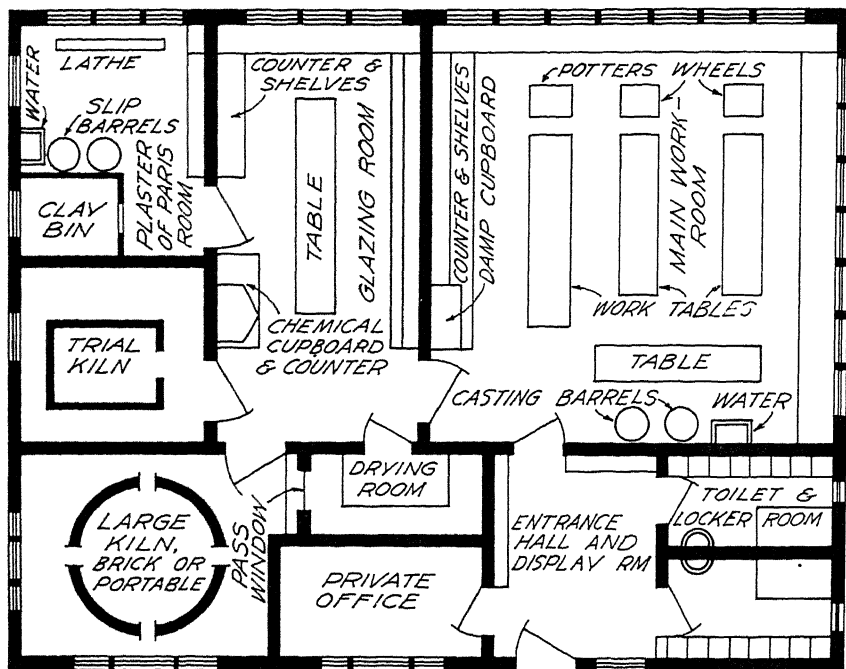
A suggested plan for a large shop. This plan can be scaled with a $\frac{3}{32}$ -in. scale, which will give an approximate outside dimension of 37 by 48 ft. However, for school work, double that size would be better.
